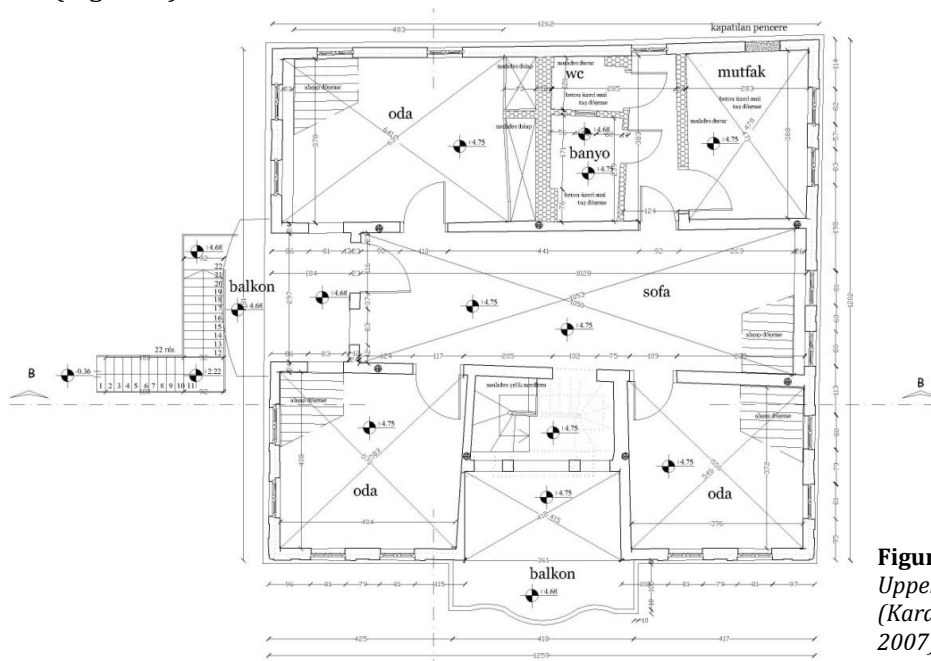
Ibrahim Kaya Mansion Upper Floor Plan-Surveying Project (Karadayı Yenice, T., Dülgerler O.N., 2007)
